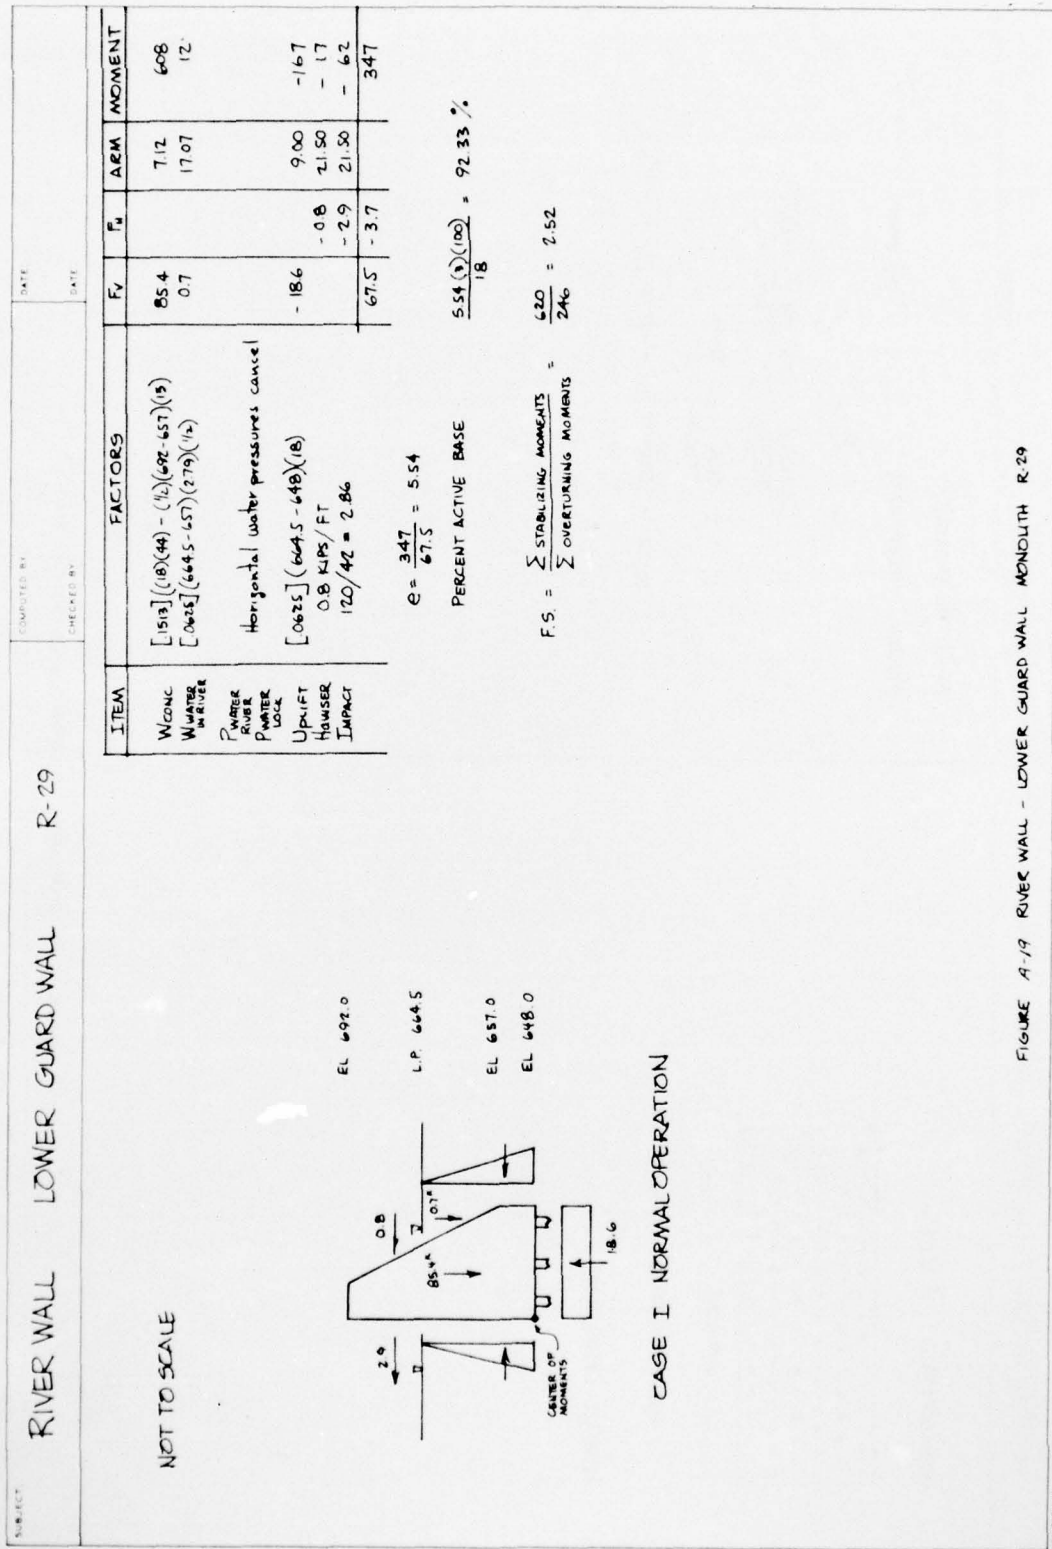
RIVER WALL - LOWER GUARD WALL MONOLITH R-29
